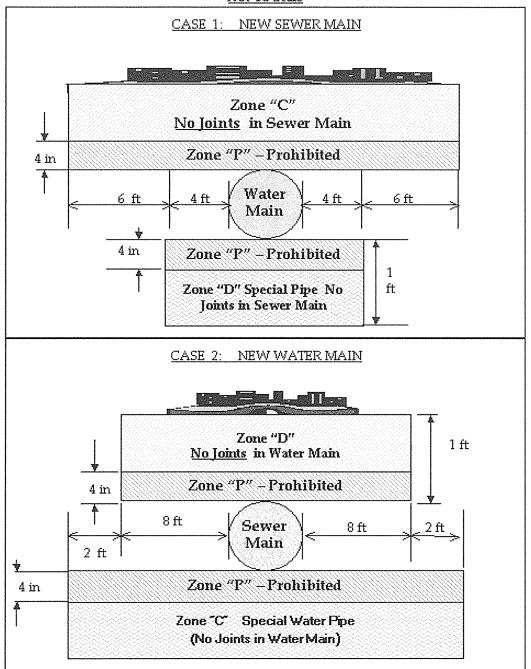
PARALLEL CONSTRUCTION Not To Scale
